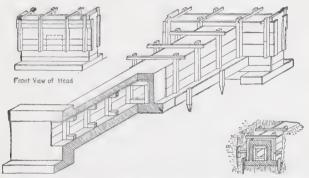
Forms for small box culvert, Mass. Hy. Commission.
